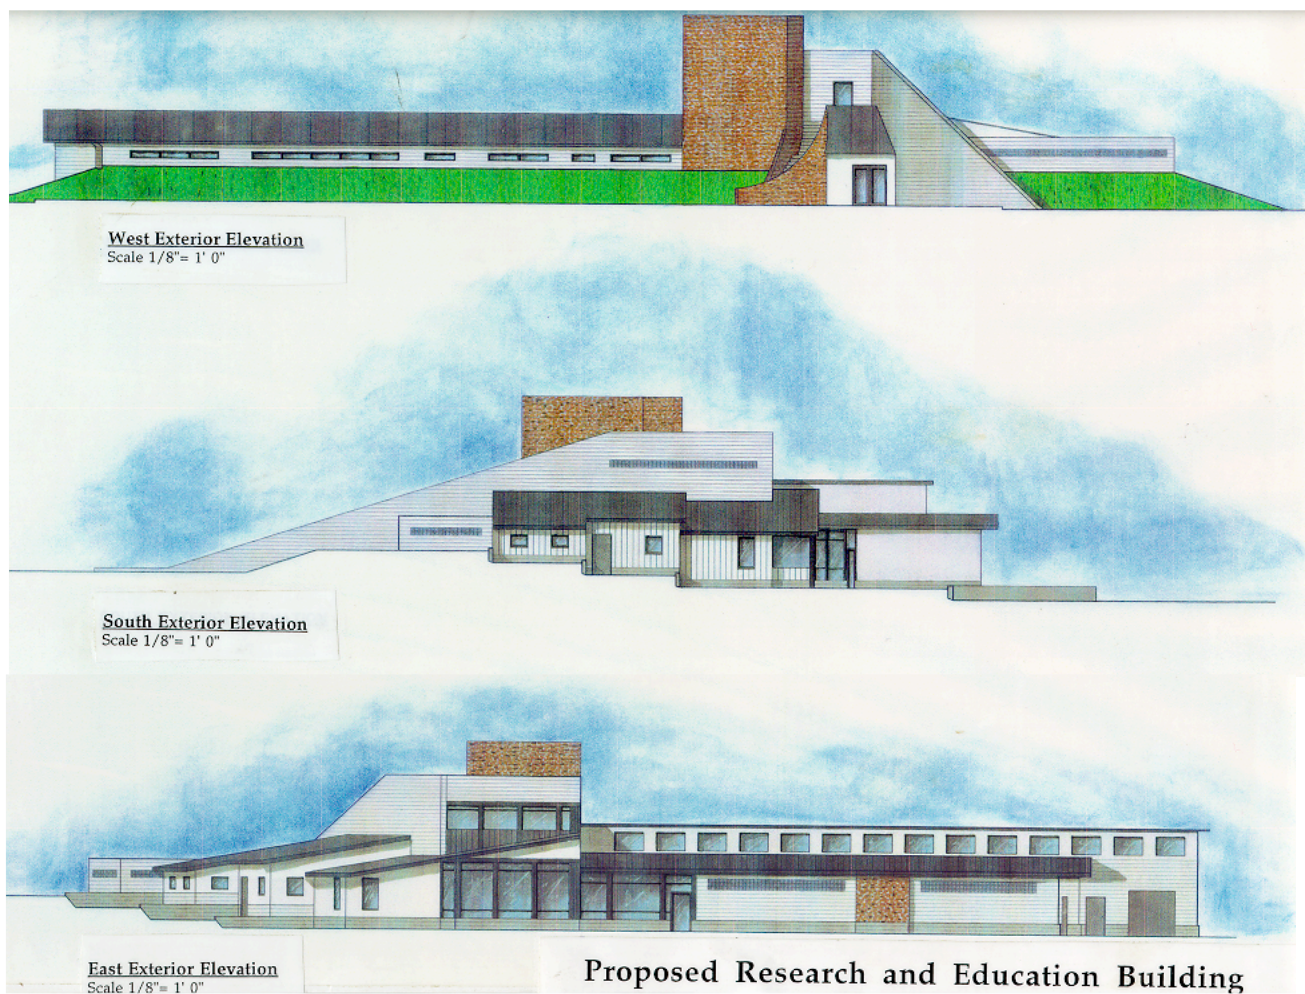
Architect's sketch of west, south, and east exterior elevations of proposed research and education building to be developed at Olentangy River Wetland Research Park.
